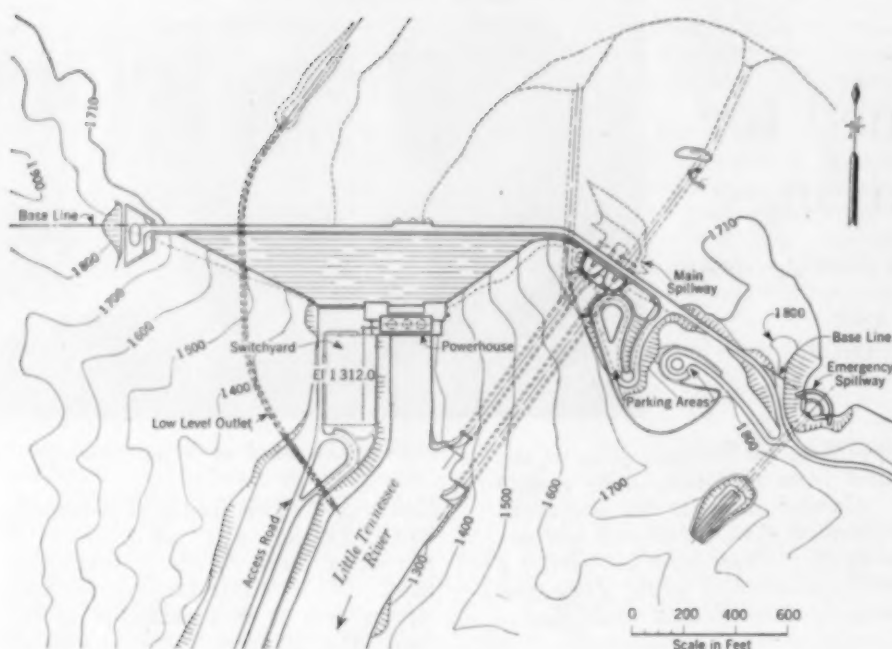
GENERAL SITE PLAN OF FONTANA DAM
